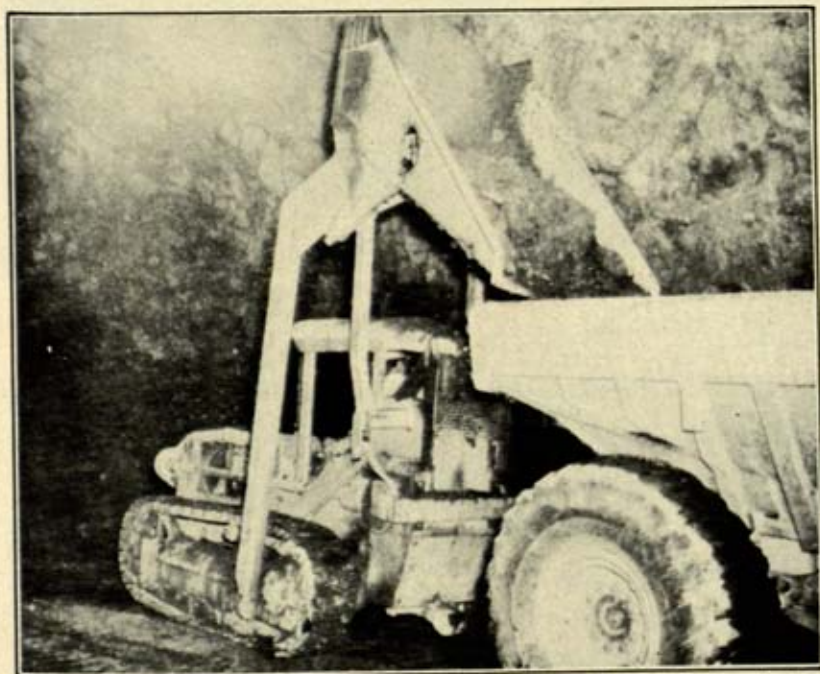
Overshot loader loading muck into a truck. (*Western Construction.*)
